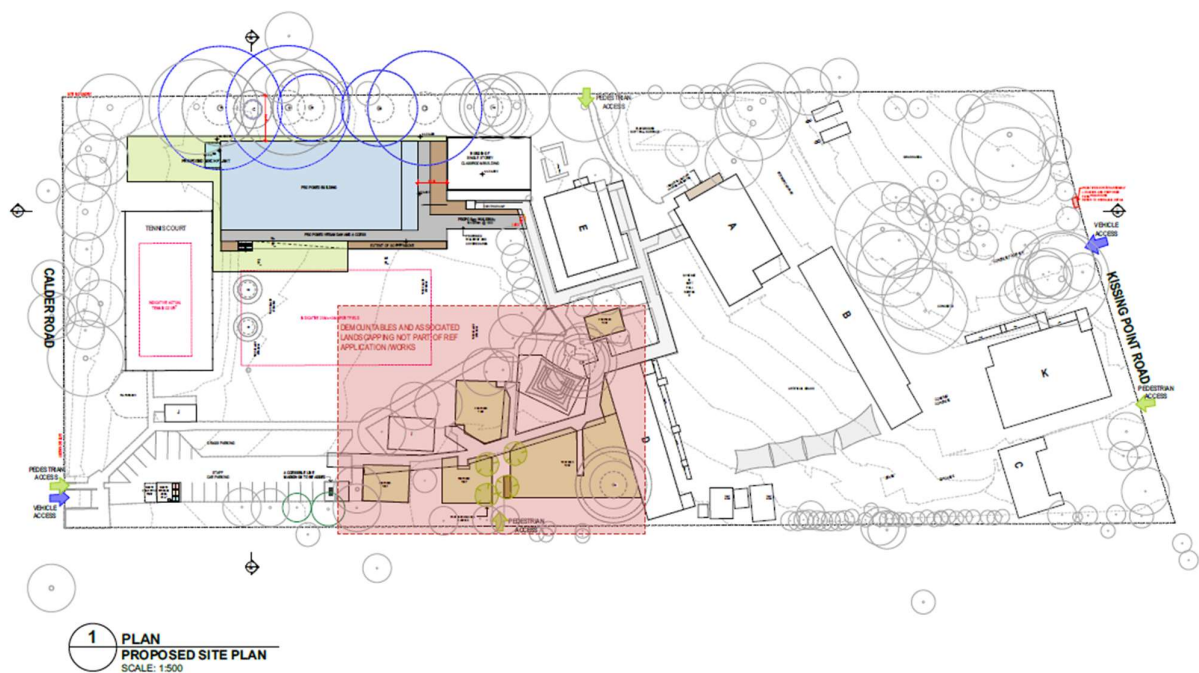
Proposed Scope of Works (Source: Fulton Trotter Architects, Proposed Site Plan (Rev P5))
